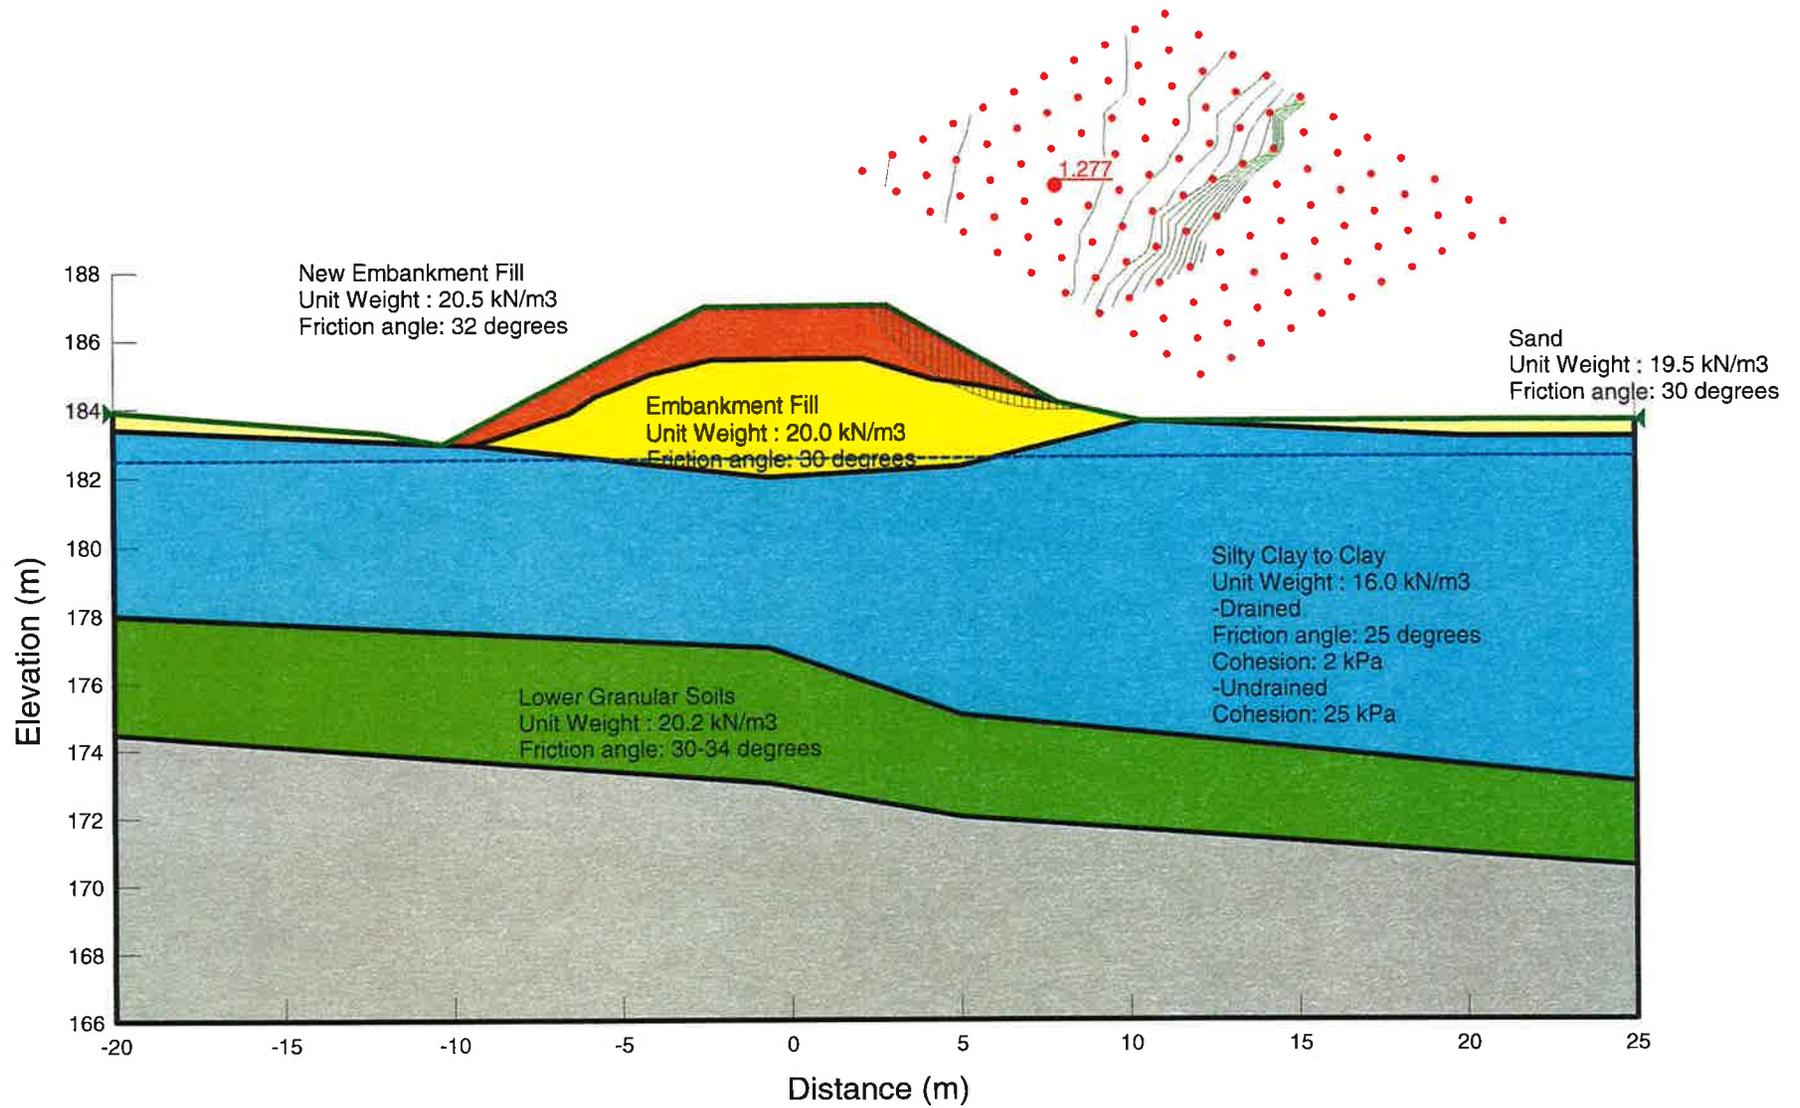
Stability analysis @ STA 10+210 with 1.0 m surcharge (south abutment location) for concrete bridge option
